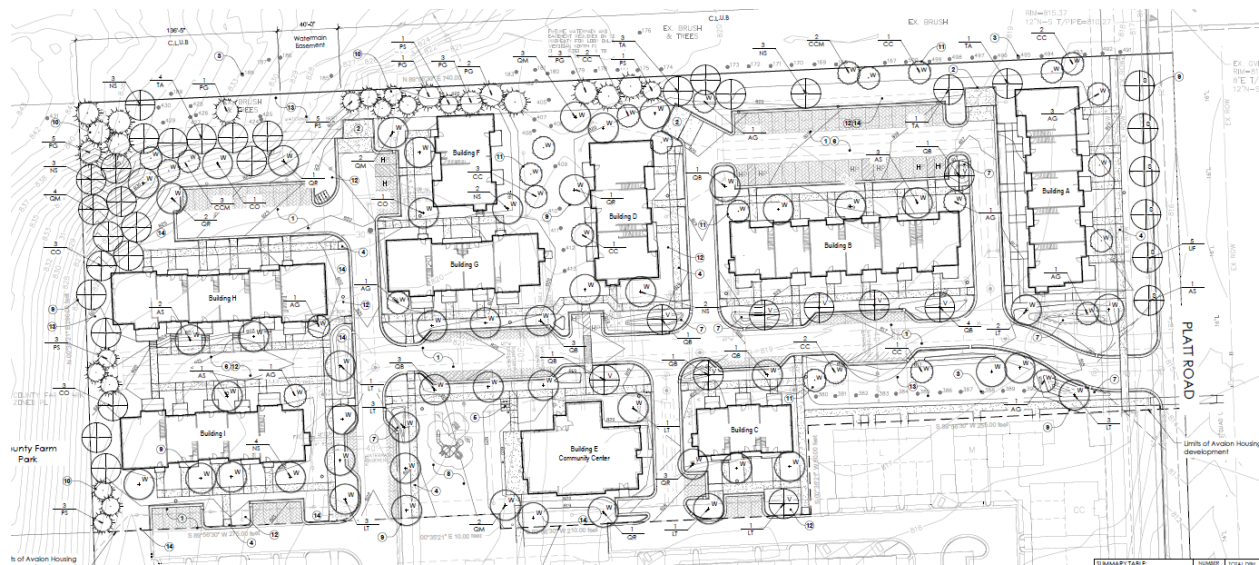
North Site Plan (Avalon) with Landscape Notes
